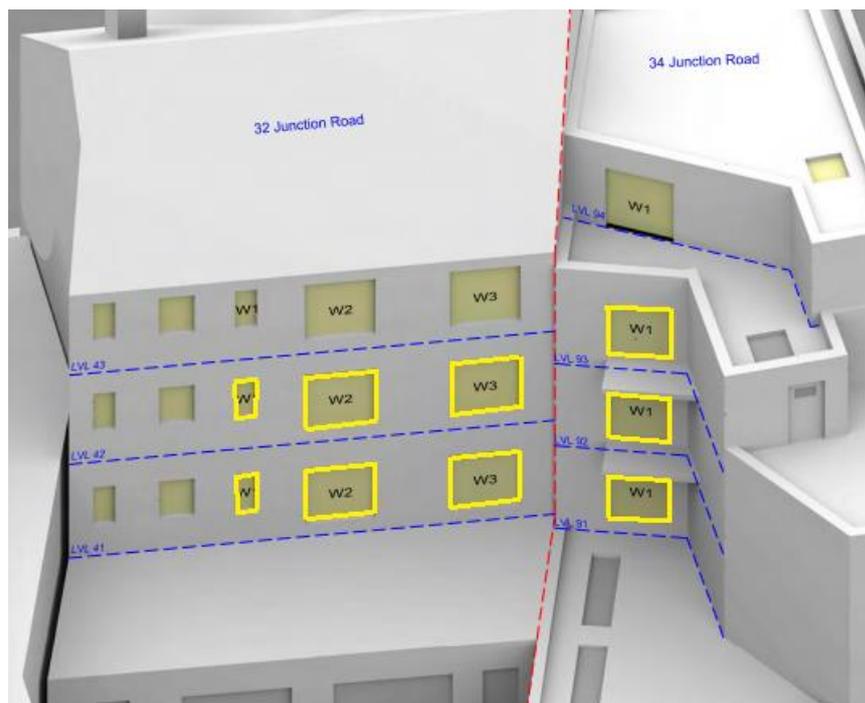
32 & 34 Junction Road – Windows affected by daylight transgressions
